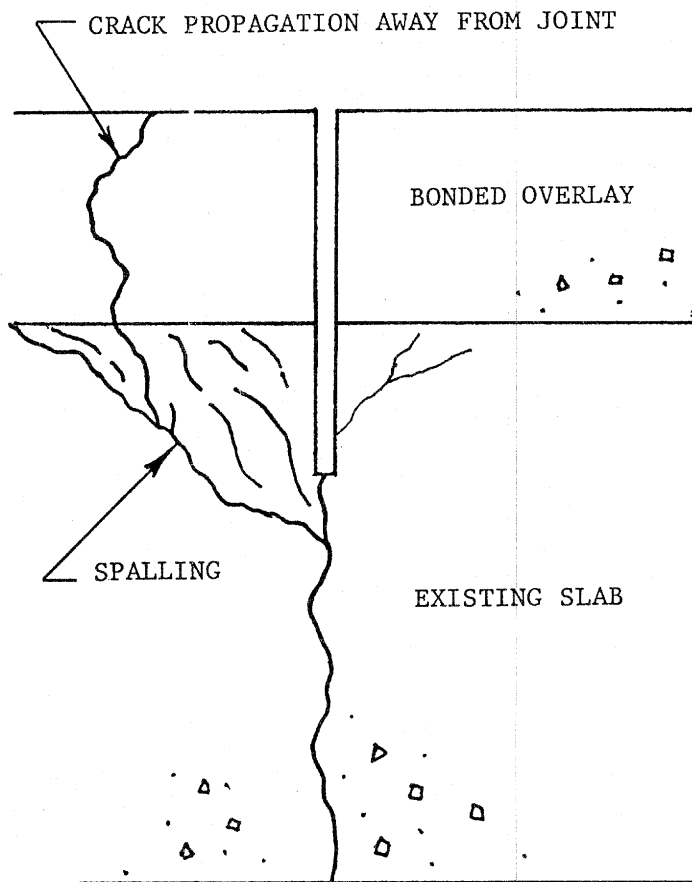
Development of secondary joint cracking in bonded concrete overlays from the propagation at a location away from the underlying pavement joint.
